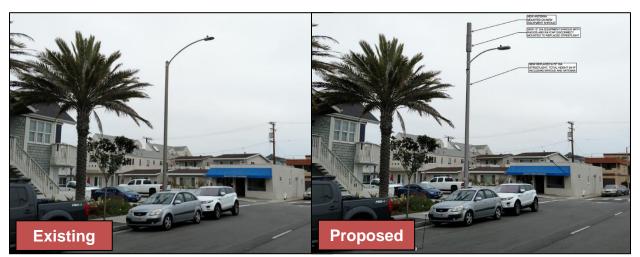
, Existing photograph (left) with proposed rendering (right) showing the replaced streetlight pole, antenna, equipment shroud, and below-grade equipment handholes.
